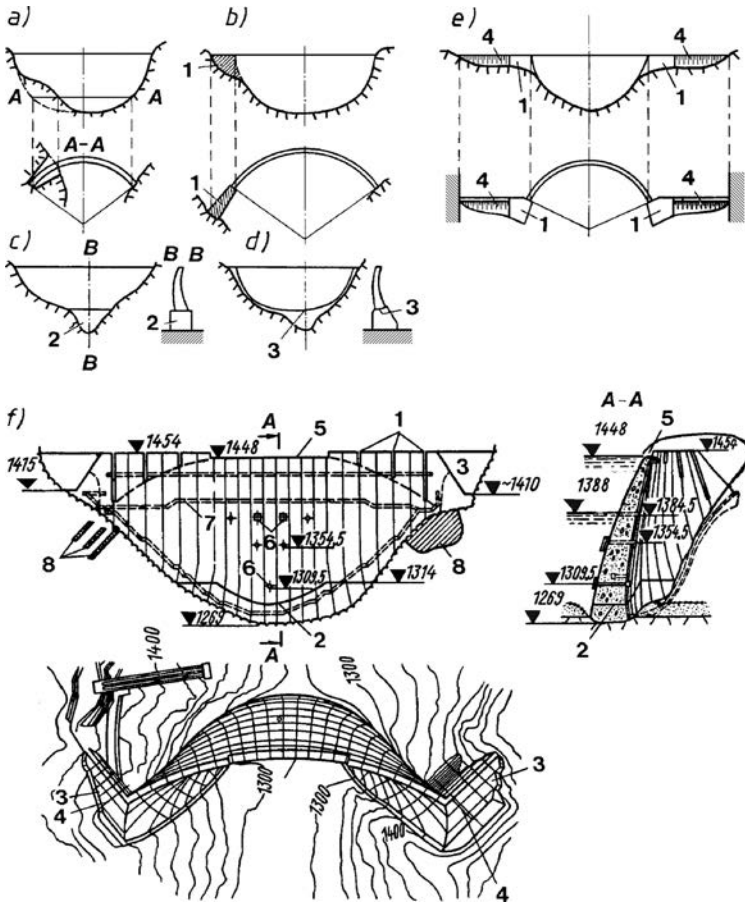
Schemes of arch dams in cases of complex form of dam site (a–e) and Kurobe dam, Japan,  $H = 186$  m (1964), example of a dam with wing gravity blocks (f) (after Grishin et al., 1979). (a–e): (1) Concrete block; (2) concrete plug; (3) contour joint; (4) wing gravity blocks. (f): (1) vertical joint-cuts, sealed at the end; (2) partial contour joint; (3) wing gravity blocks; (4) constructional joints between the dam and wing blocks; (5) spillway; (6) temporary (construction) spillway openings; (7) outlet works; (8) deranged zones, strengthened in the course of construction.
